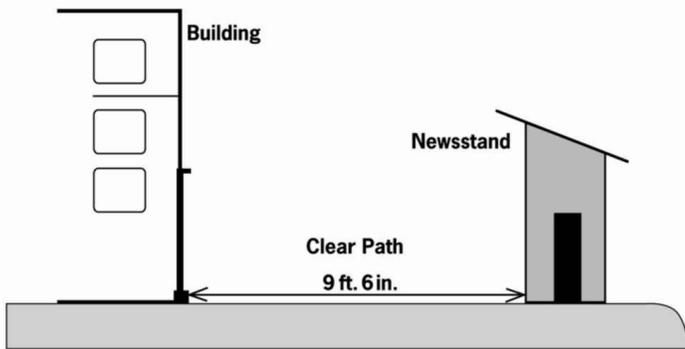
Typical full block front plan showing clear path for property – line newsstand.
